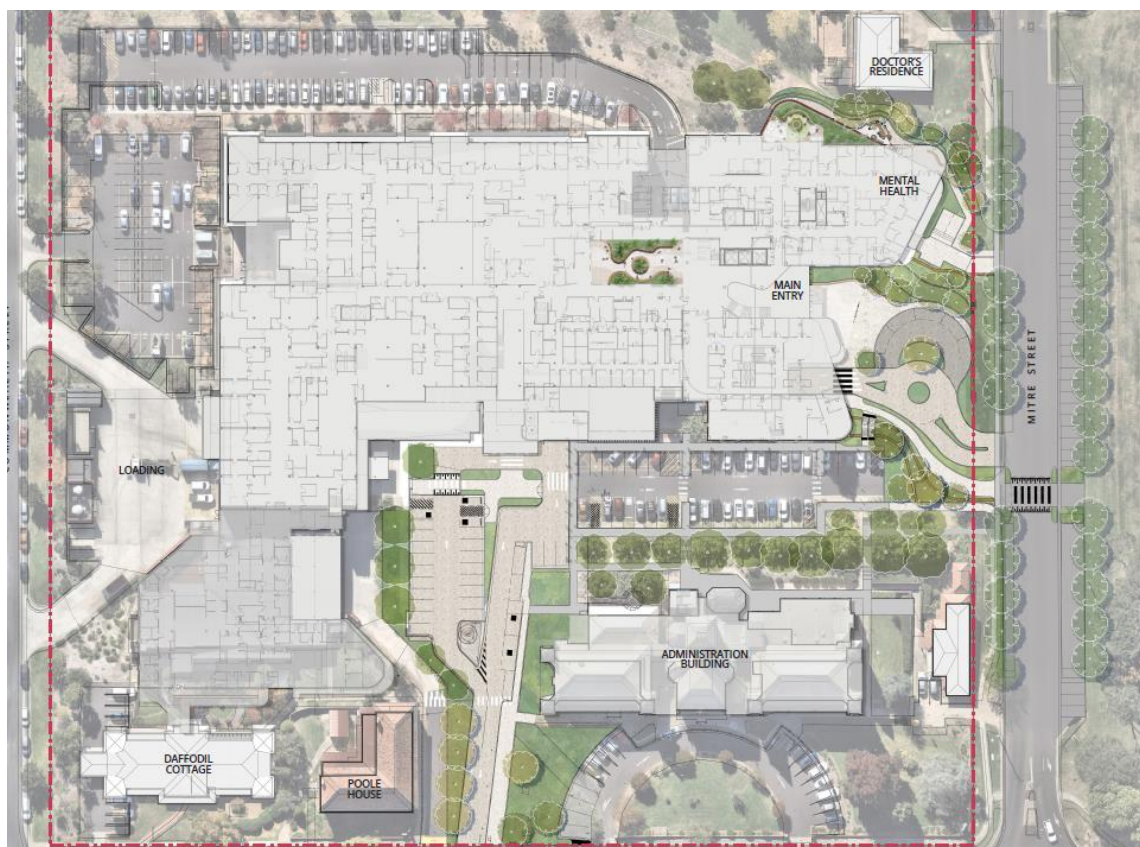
Landscape master plan showing landscaped areas across the campus (courtesy: Arcadia, 2024)
